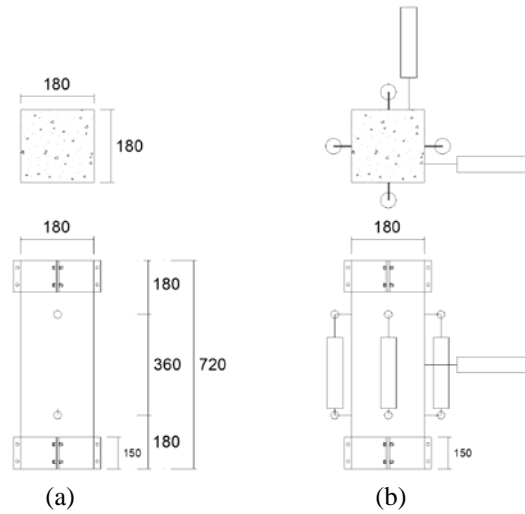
Test setup of column specimen (a) elevation, (b) LVDTs positions
